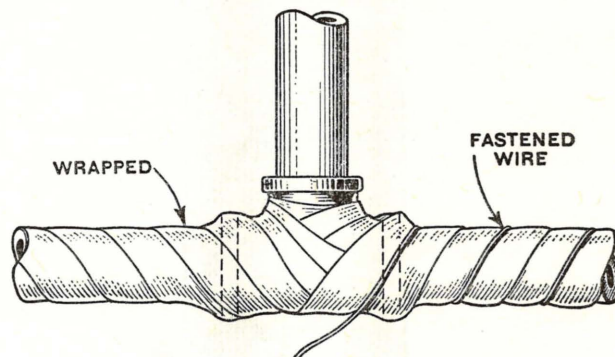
Pipes may be wrapped with asbestos sheeting and tied with wire
